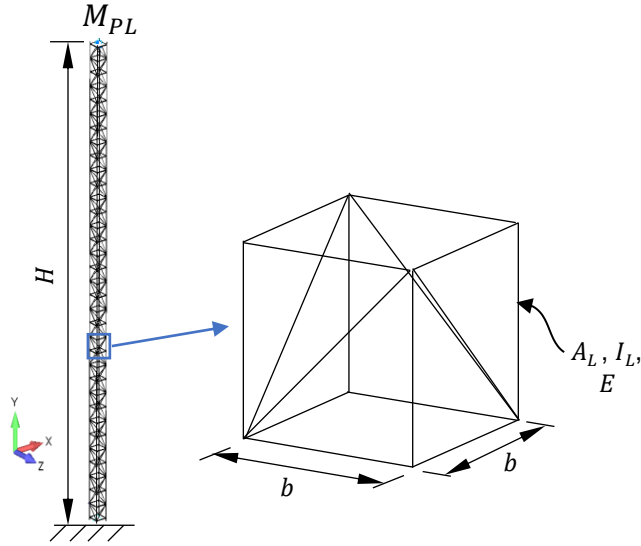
Prismatic truss tower, with the truss connectivity assumed following [2, 3].
